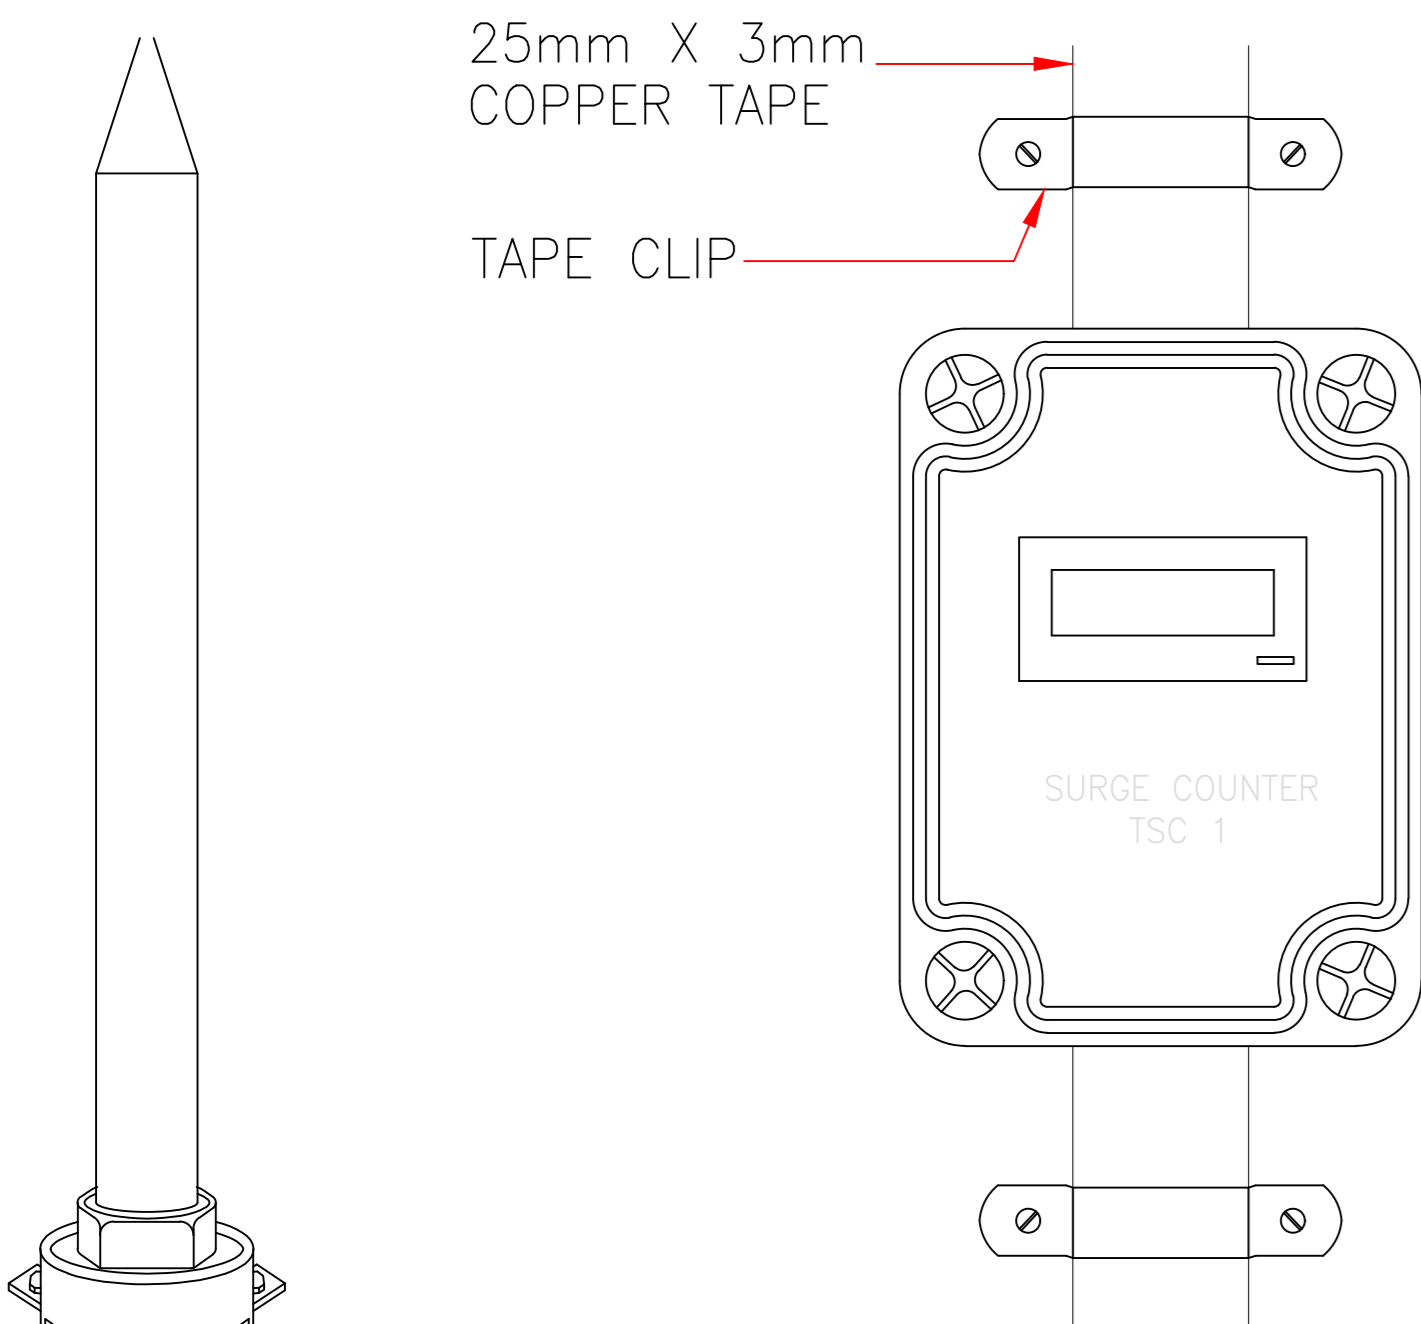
DETAIL 'A' (PART OF LIGHTNING PROTECTION DIAGRAMMATIC)
